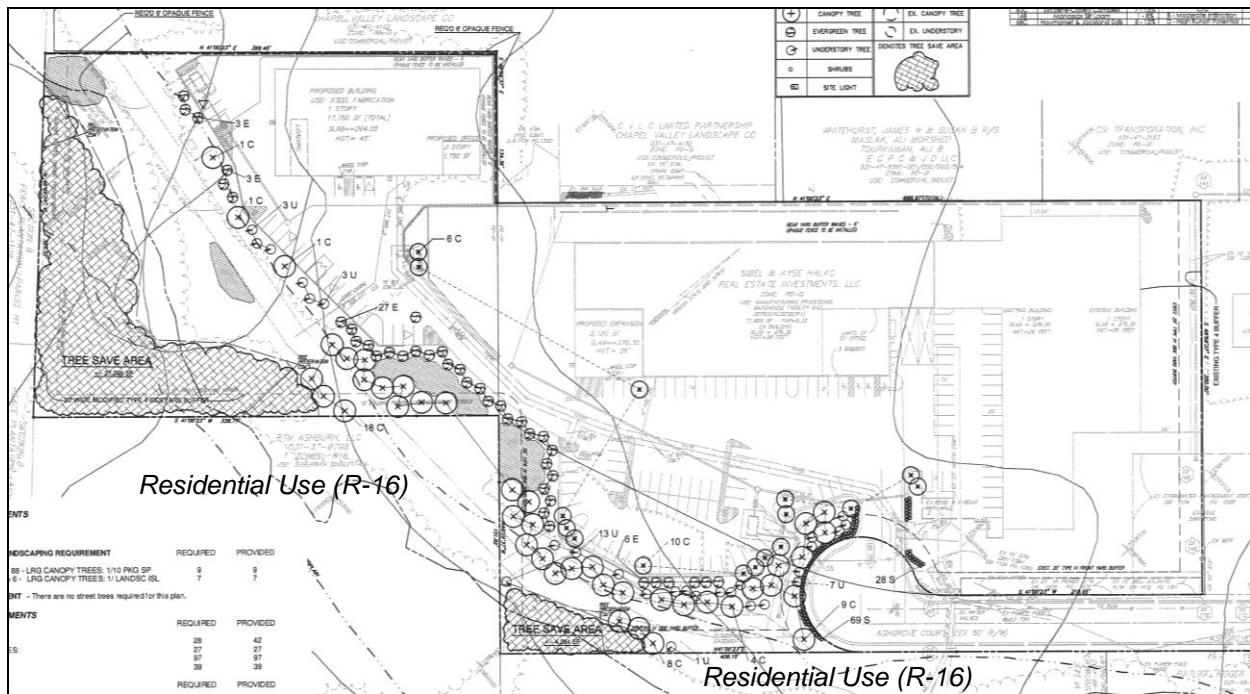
ZCPA 2008-0008 – Landscape Plan, Exhibit C
